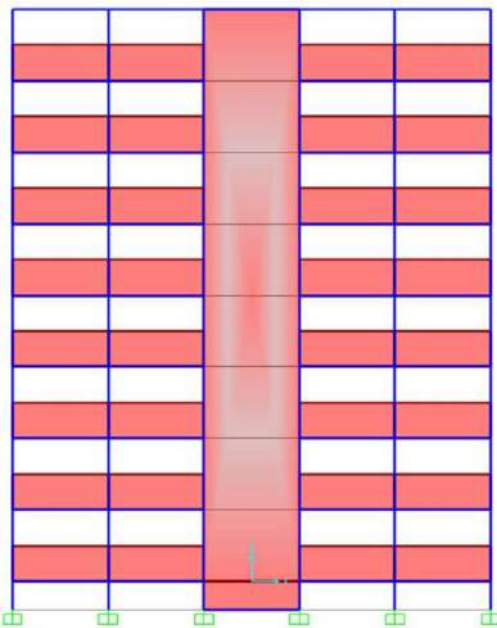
Elevation of 50% Partially in-filled frame with shear wall
